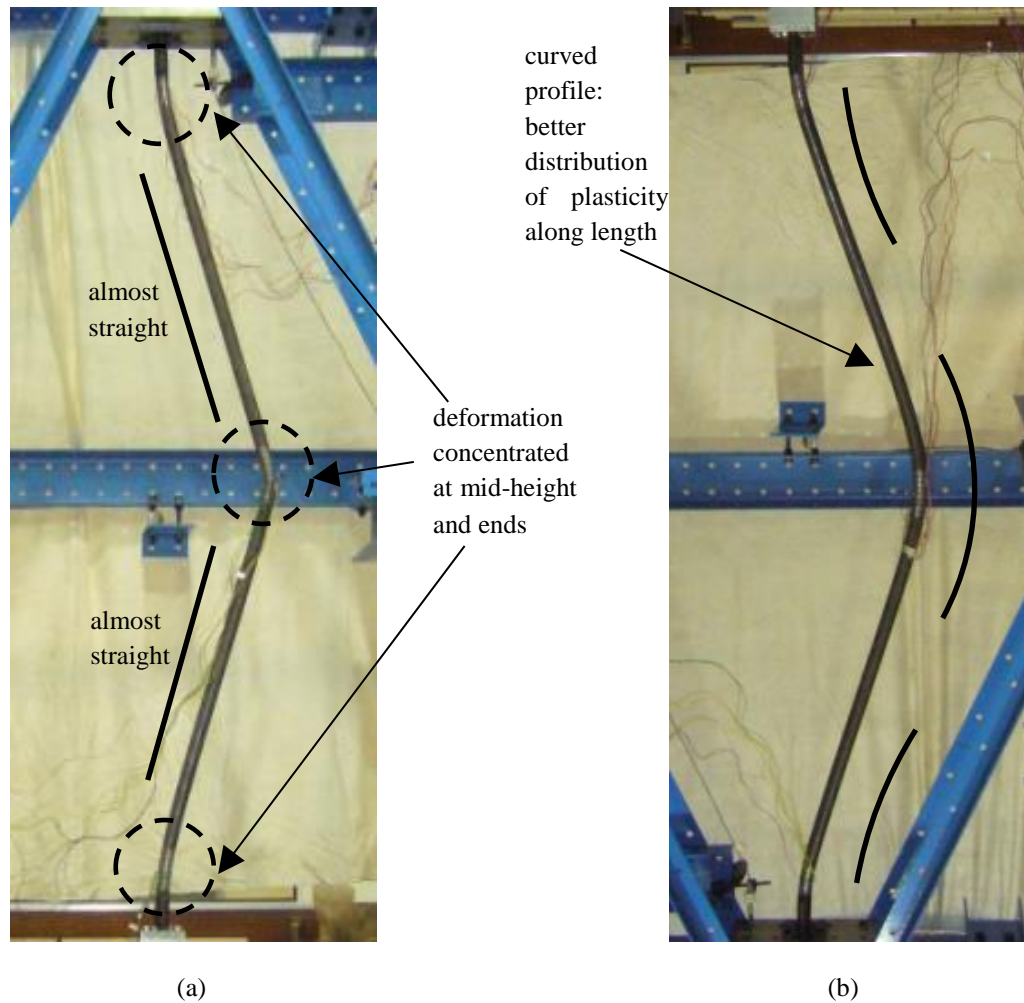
Global deformed shape for (a) hollow specimen; (b) concrete-filled specimen
